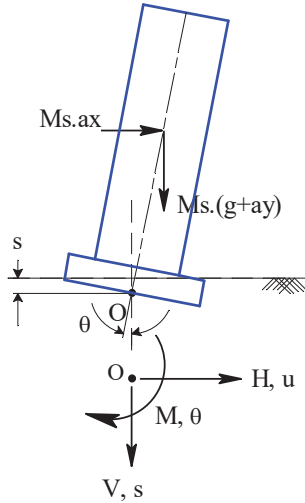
Simplified schematic of a rigid structure–foundation system rocking on soil and the major forces acting on it during earthquake loading.
